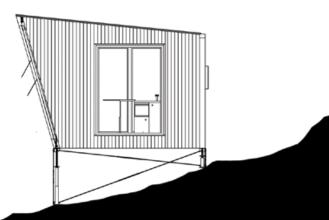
34. East elevation with 1500mm & 500mm high foundations adapting to an uneven ground surface. Scale 1:100
